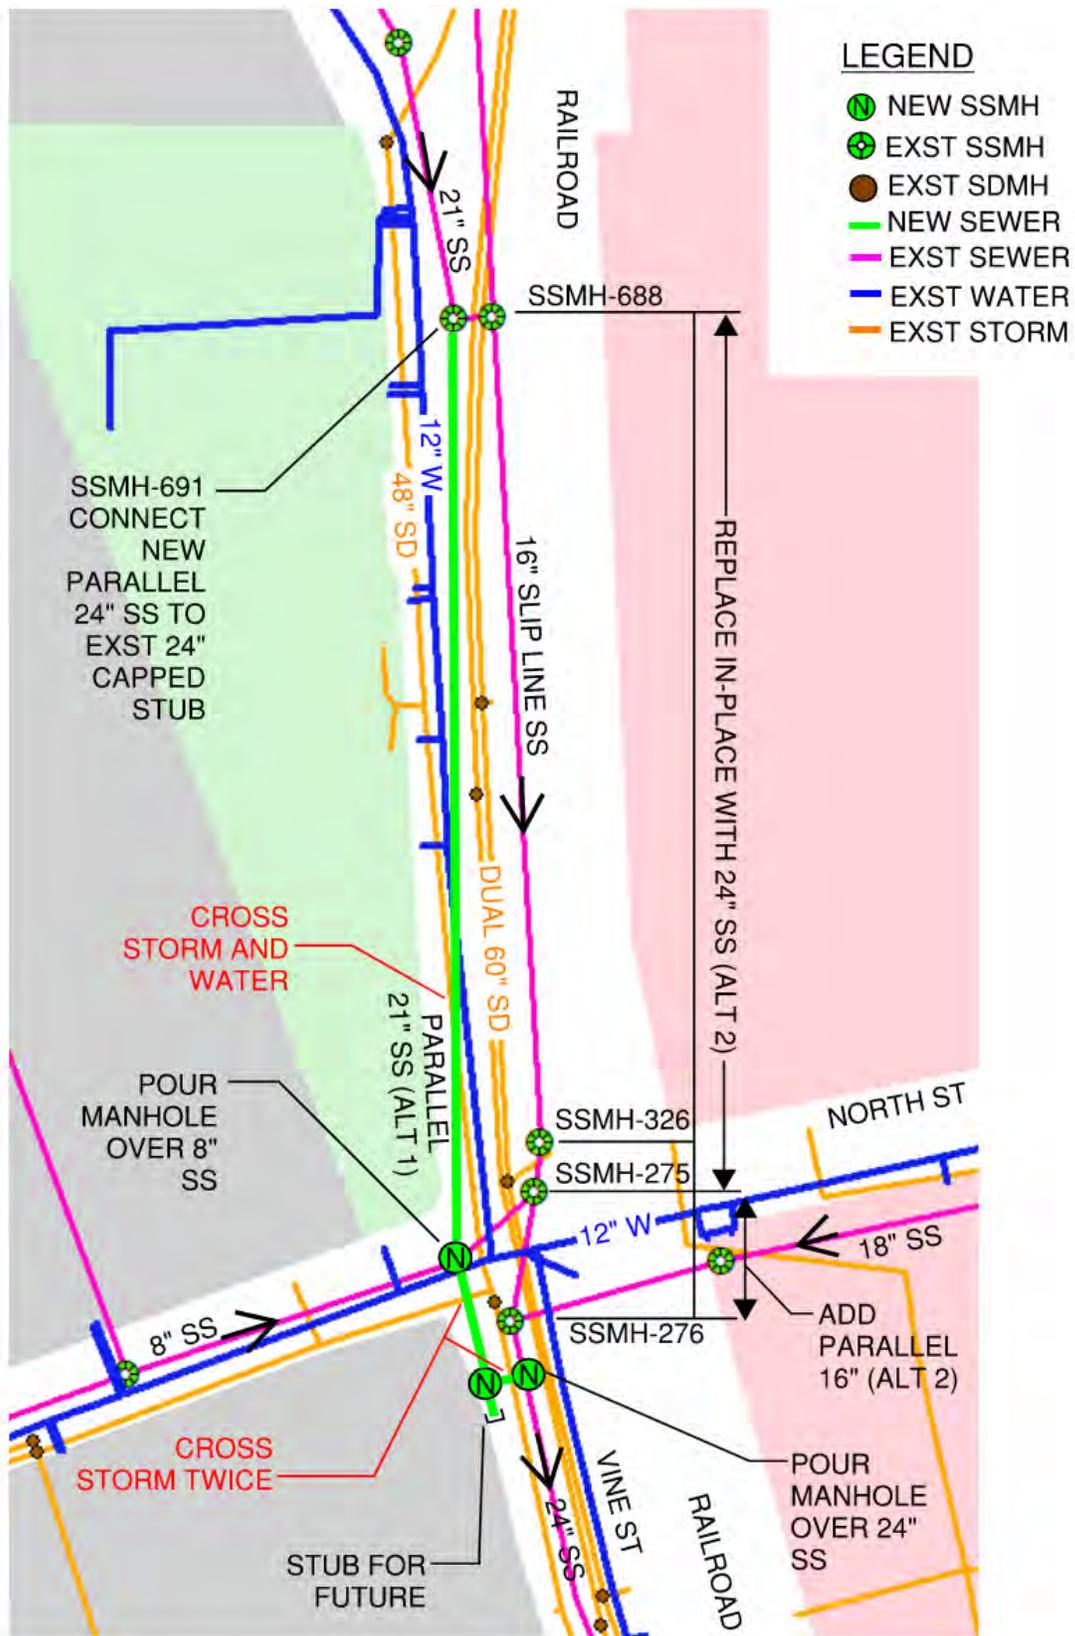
Lower North Trunk Sewer Alternatives 1 and 2
